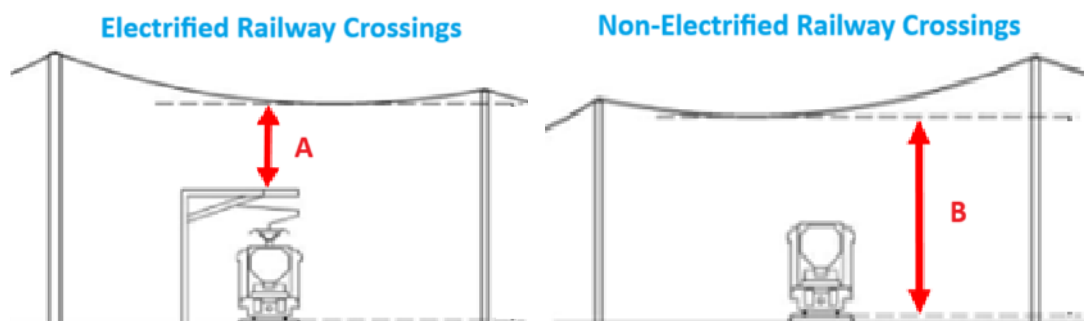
Clearances for Railway CrossingsTable 36 – Minimum Clearances - Railway Crossings
